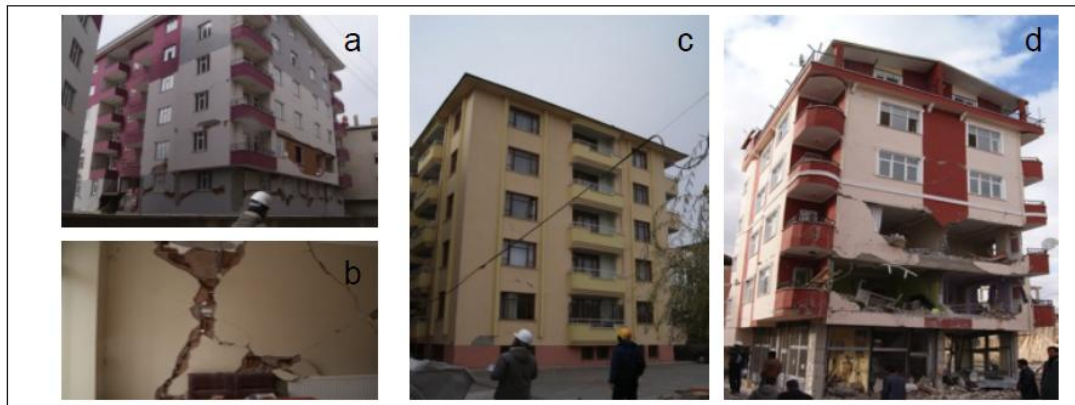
Infill Wall Damages Observed After the Earthquake in Van, 2011 a) in Plane Damage, b) Interior Wall Damage, c) Moderate Damage, d) Heavy Damage of the Inner and Outer Plane (Yakut et al., 2013).
